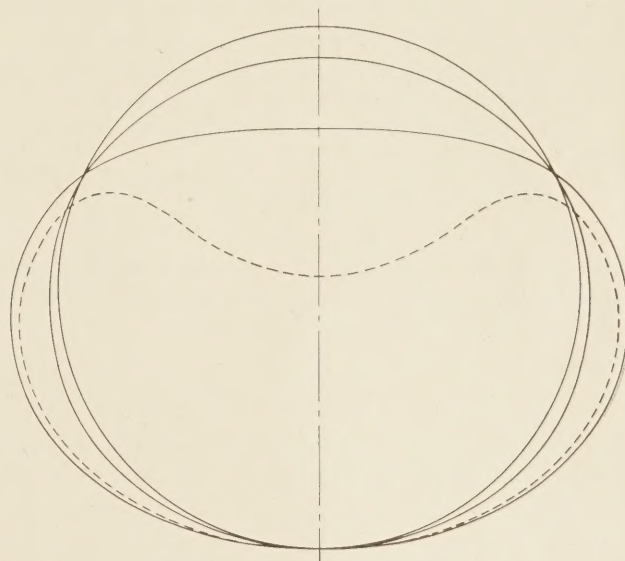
SHAPES TAKEN BY A FLEXIBLE CULVERT PIPE DURING DEFLECTION UNDER VERTICAL LOAD.
